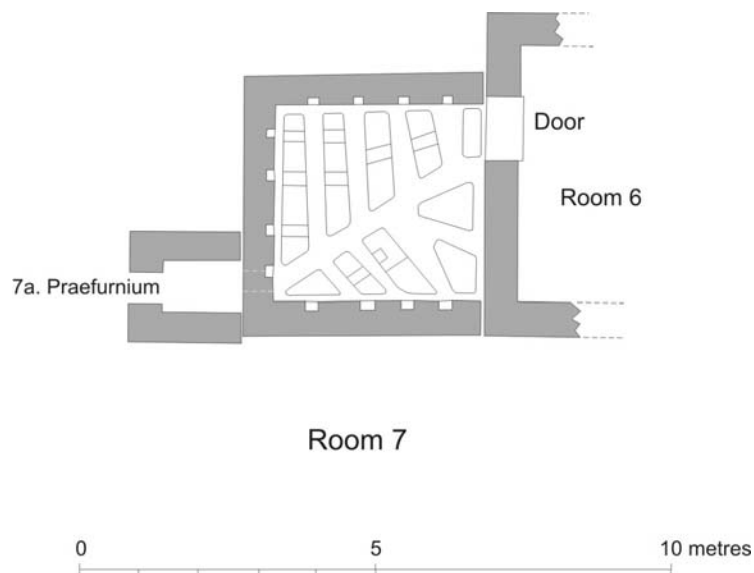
Detail plan of room 7 showing pier supports for floor, wall flues and the *praefurnium* (stoke hole).
